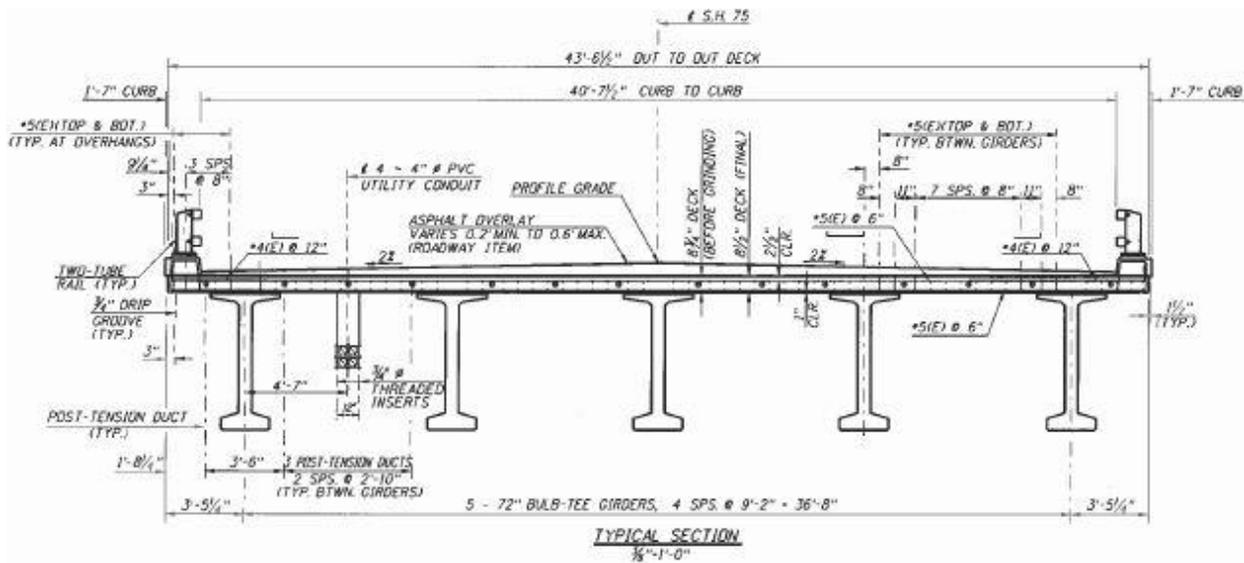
Diagram. Typical section of the new main Salmon River Bridge.
